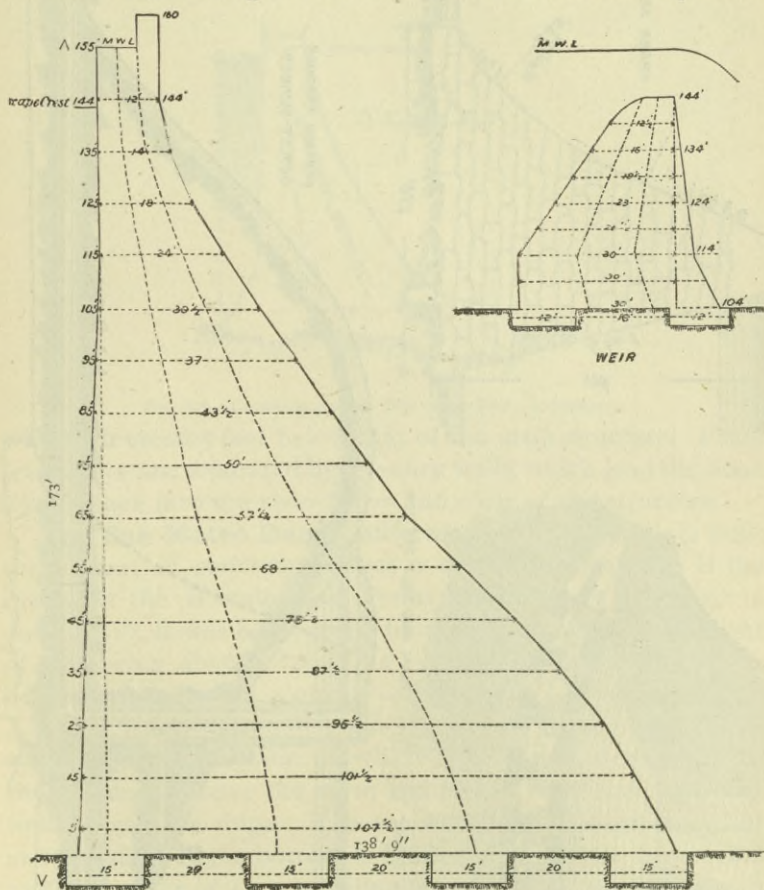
CROSS-SECTIONS OF PERIAR DAM AND WASTE WEIR, INDIA.
